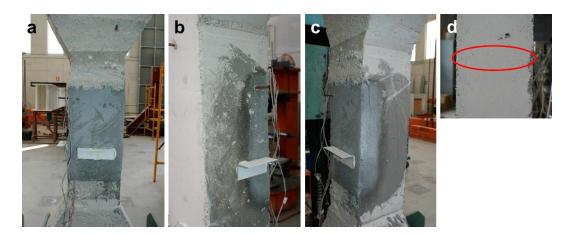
Column failure: Specimen P3W (repaired column with R3-mortar and no BA) : a) Side 1; b) Side 2; c) Side 4;
